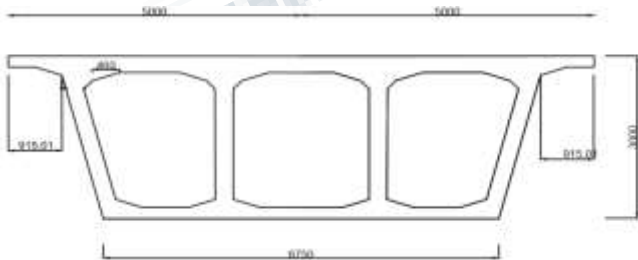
(b) Cross Section of the Sloped Exterior Girder Deck (all dimensions in mm)
